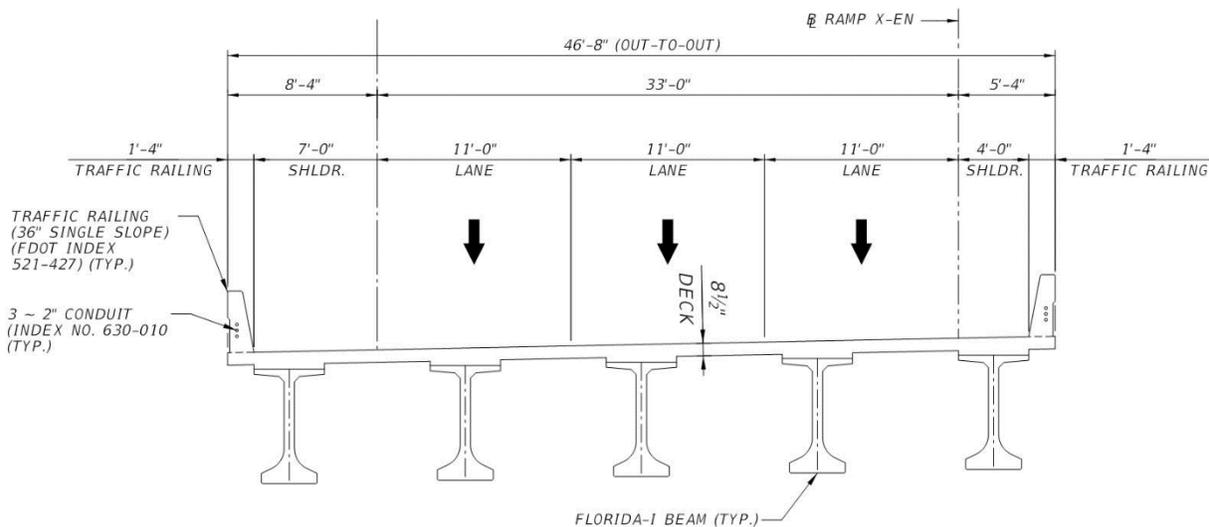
Bridge Typical Section (Bridge No. 7)
